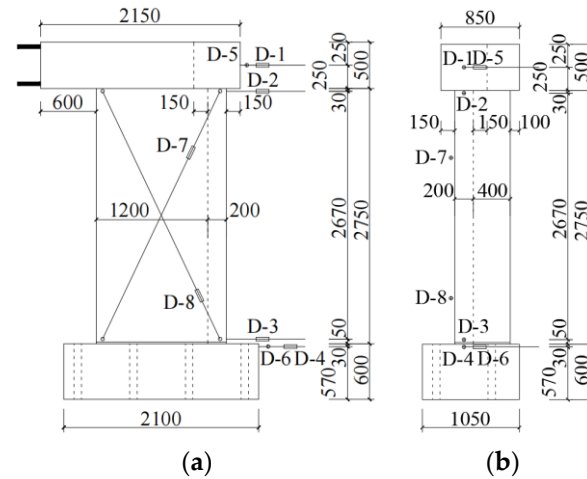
Dimensions of specimens and arrangement of displacement gauges: (a) front elevation of the specimen; and (b) side elevation of the specimen.
